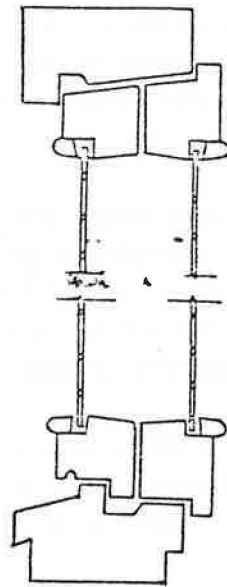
A cross section of the standard coupled window with double glazing
